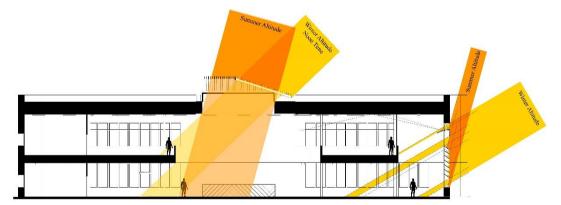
Building Cross Section Illustrate the Predicted Behaviour of Shading Strategies (by Author).
